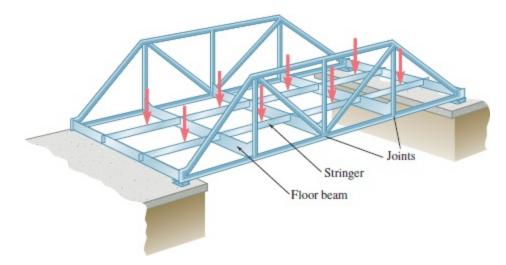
(*a*) A typical truss consists of straight members connected at
